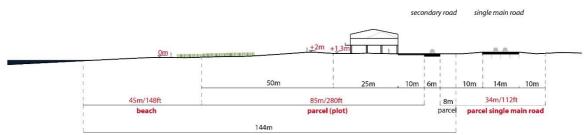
Design cross section C: Narrow residential corridor – single main road
